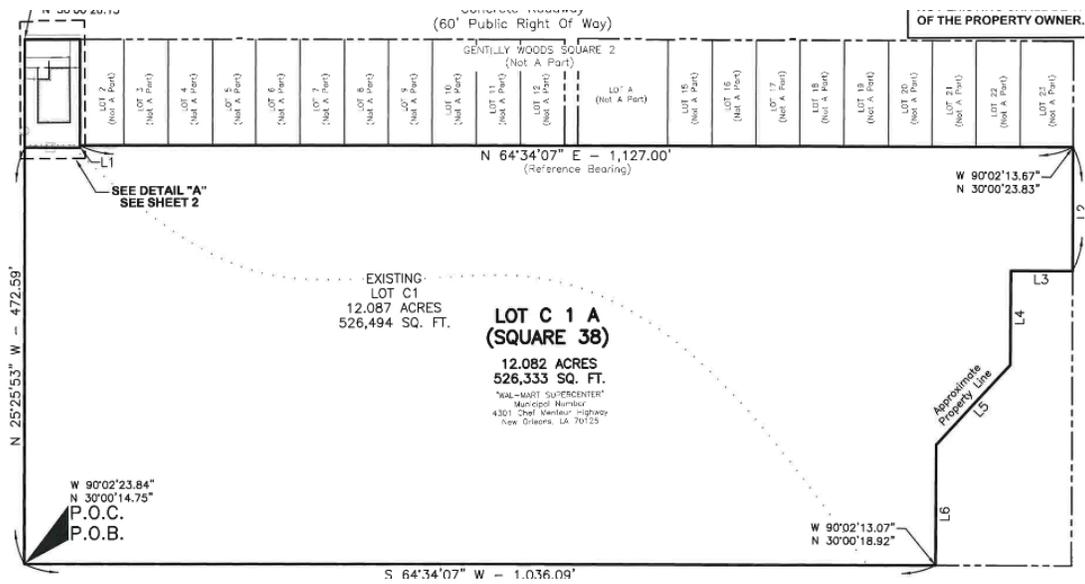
Existing Lot 1 and Proposed Lot 1A
